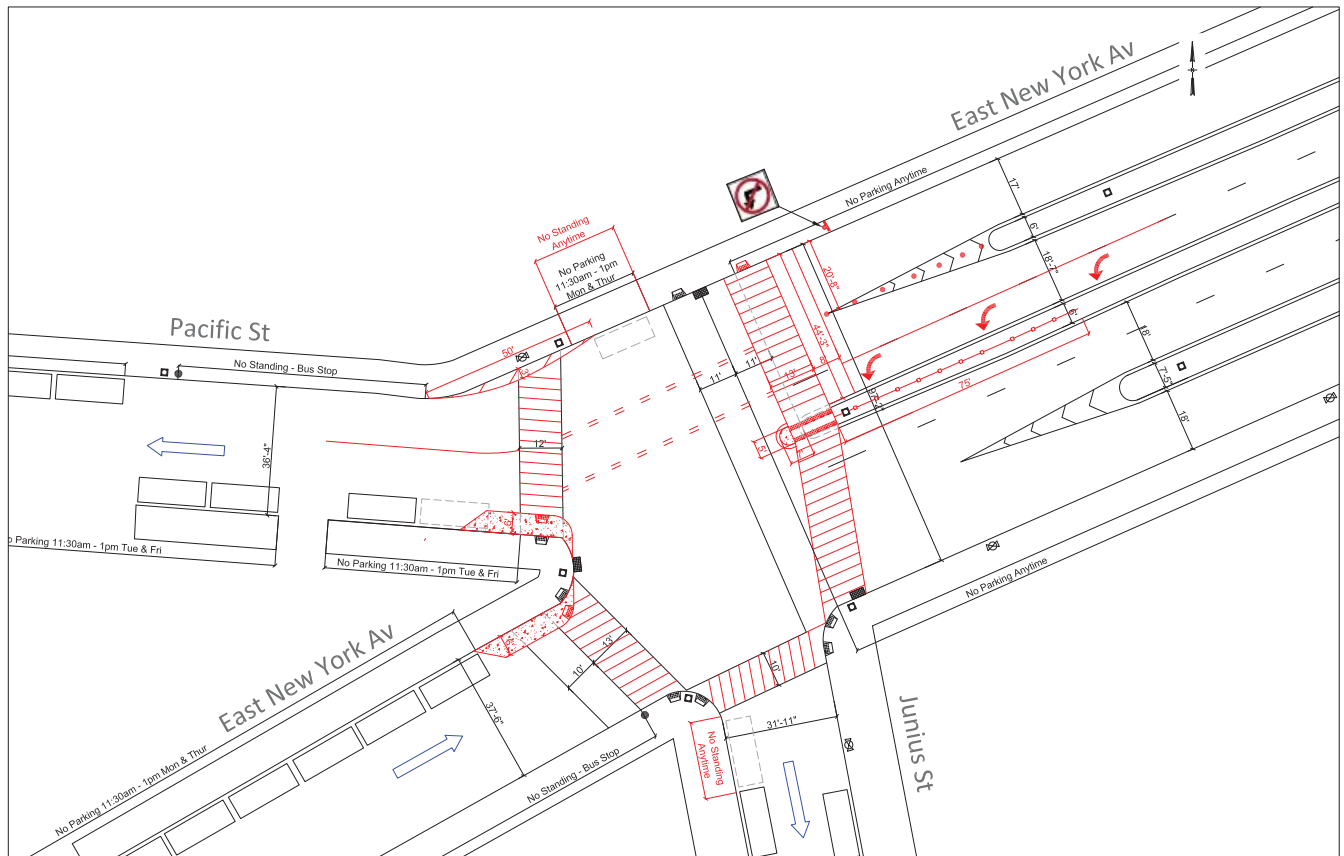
East New York Avenue & Junius Street - Proposed
